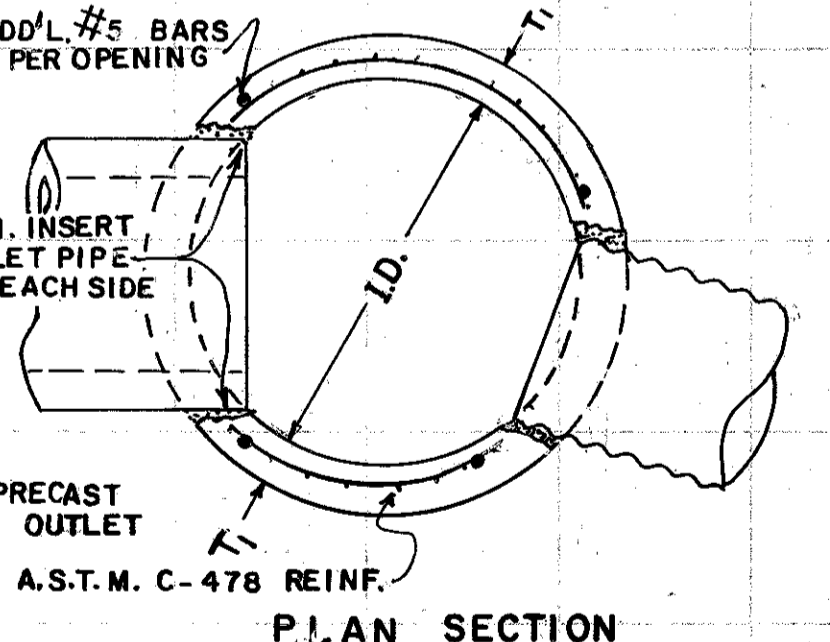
DETAILS OF CIRCULAR PRECAST JUNCTION BOX
